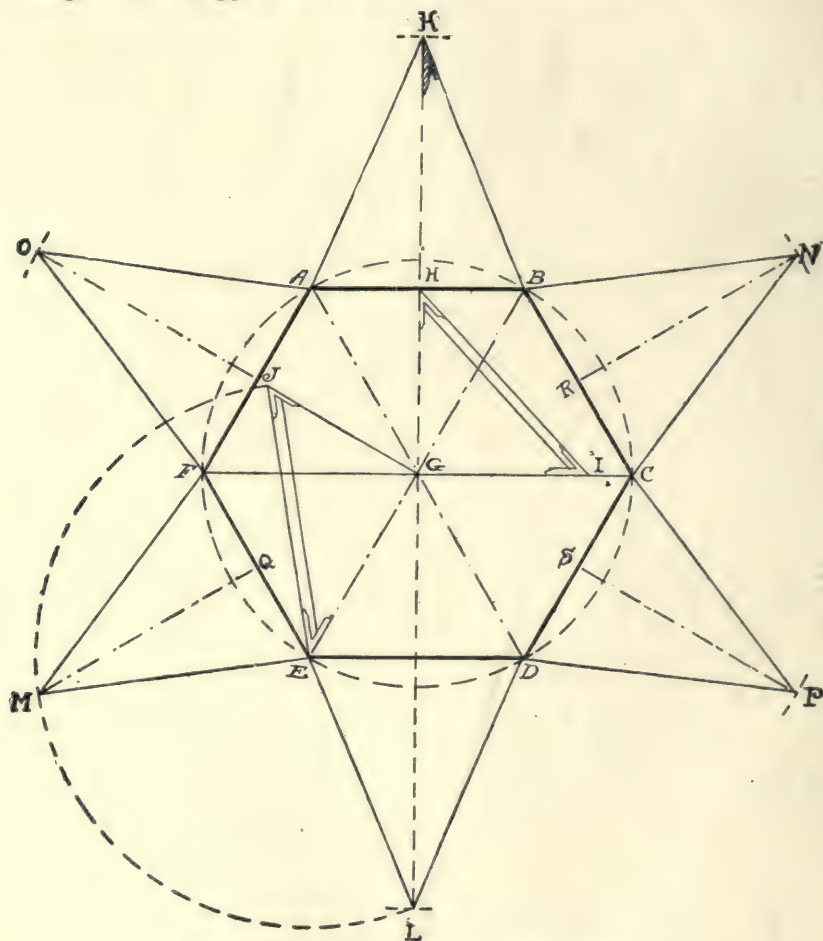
Diagram of a Roof of Hexagonal Plan.
